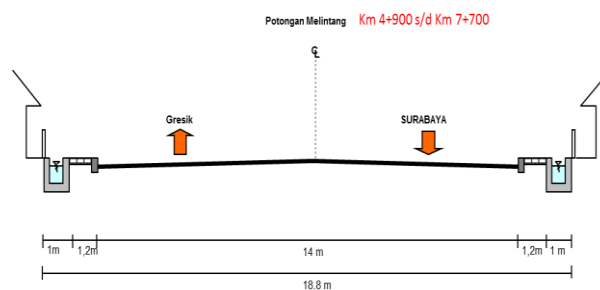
Cross section of Jl. Gresik Km 4+900 to Km 7+700
